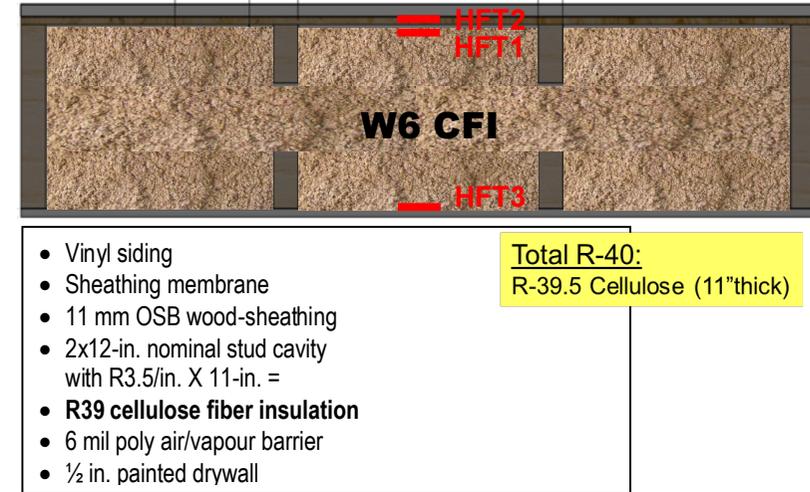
Wall 6 (W6: CFI) - Horizontal cross-section through cellulose fibre (MF) wall assembly showing locations of HFT
